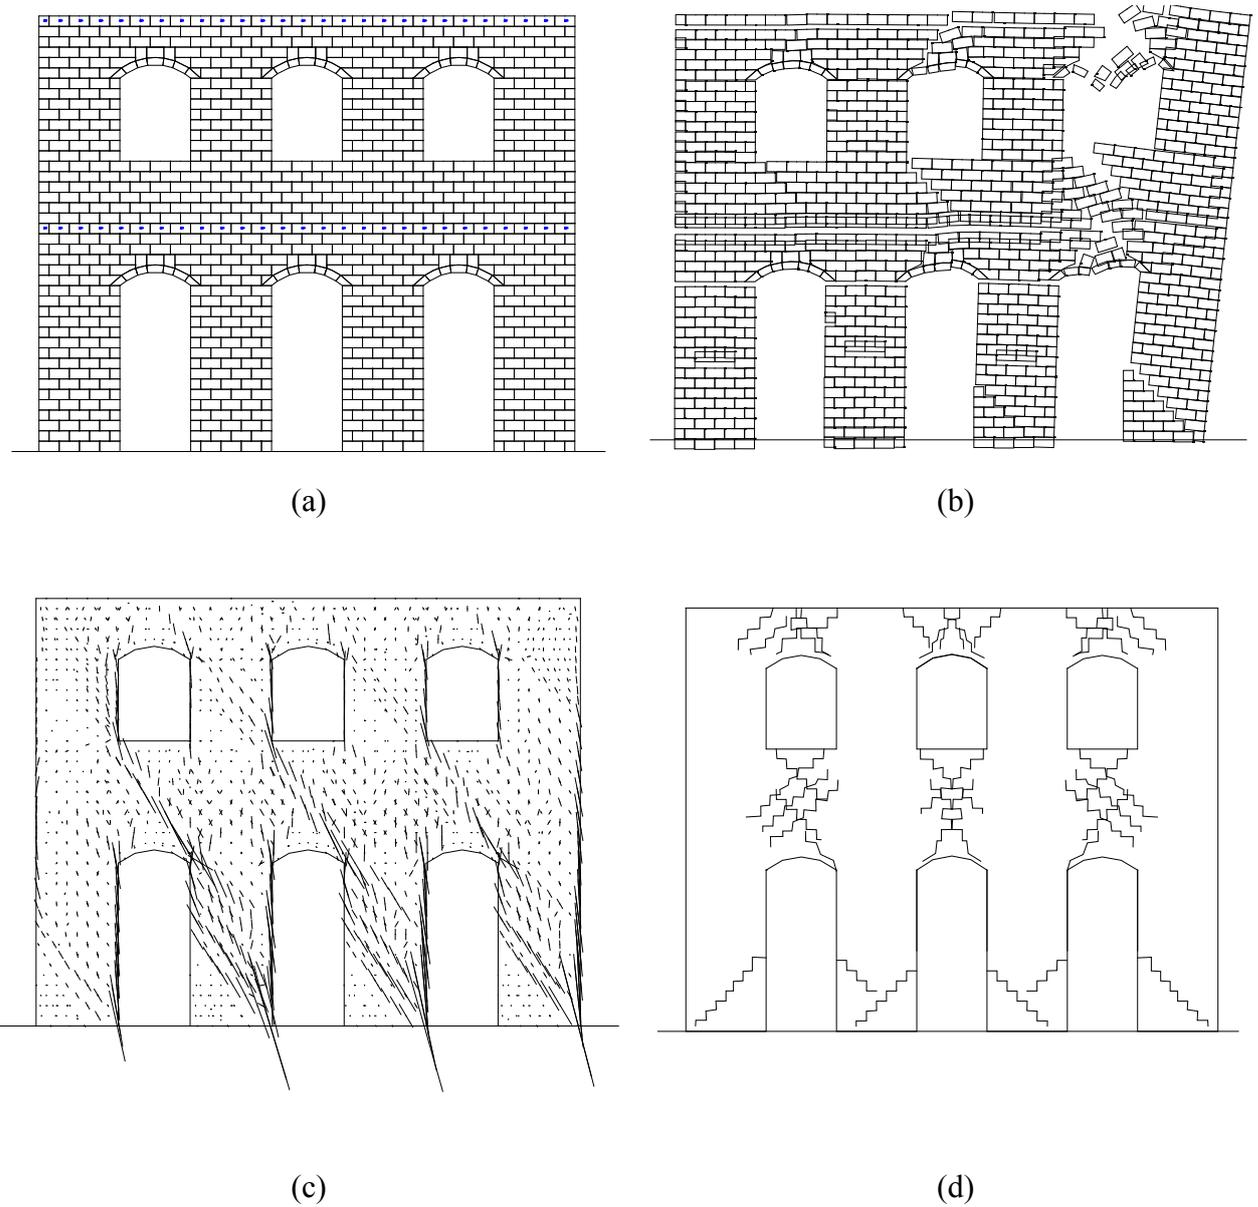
Addition of a Pier to the Standard Masonry wall 1; Seismic coefficient,  $\alpha=0.497$ , (a) Block model, (b) Failure mechanism, (c) Thrust lines, (d) Crack pattern
